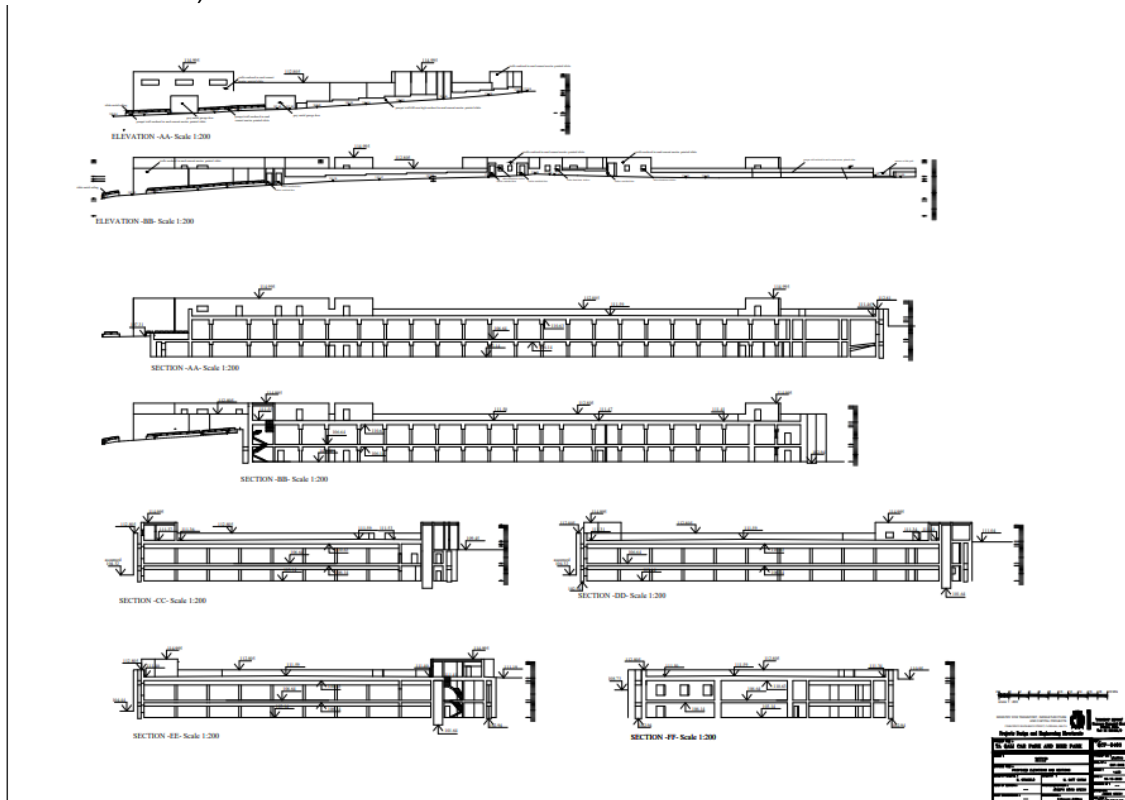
Proposed elevation and sections (Source: E-apps doc PA2262/20/67e)
